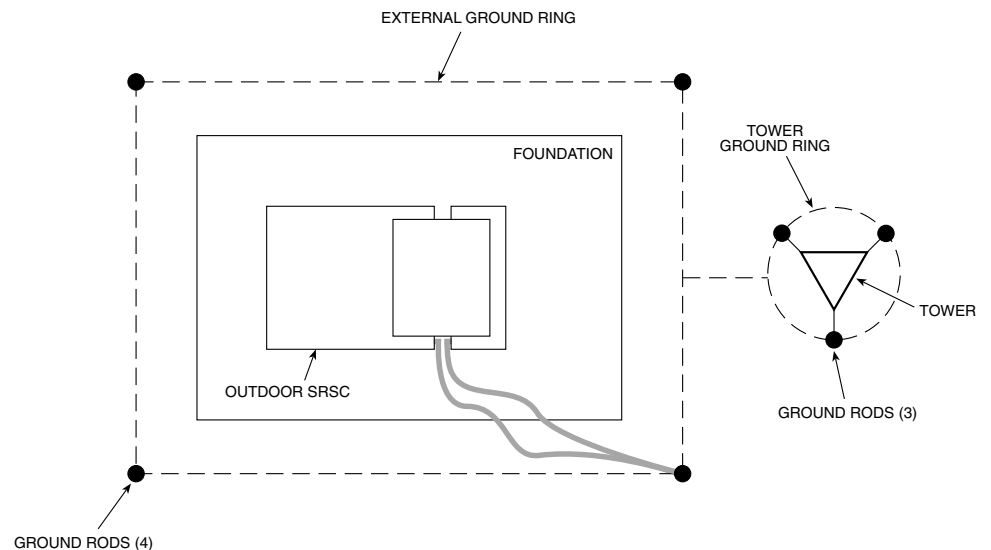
Typical Ground Ring Installation for Outdoor SRSC Site
